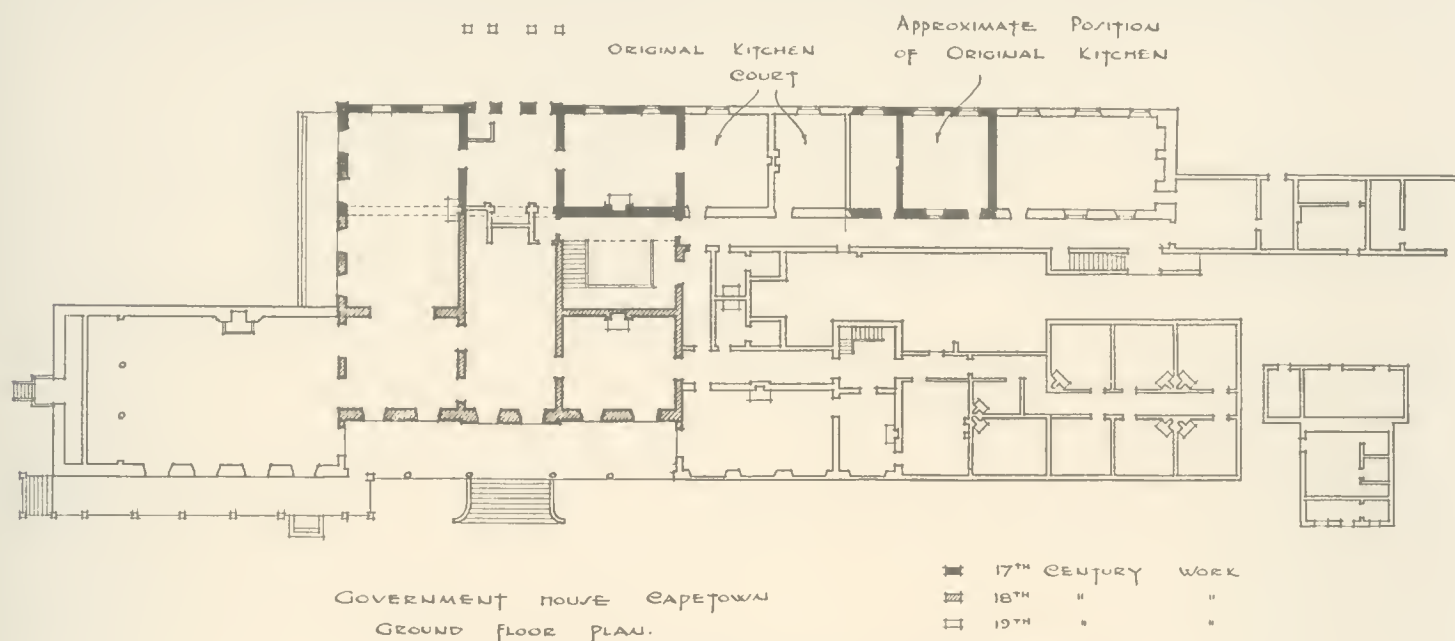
PLAN OF GOVERNMENT HOUSE, CAPE TOWN
